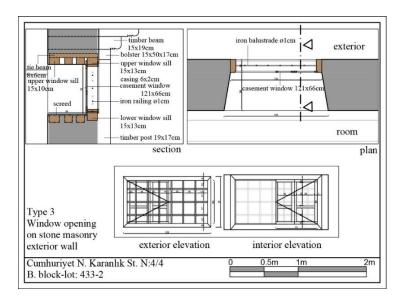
Drawing of window opening located on stone masonry wall; Type 3 (Cumhuriyet N. b. block-lot: 433-3)
